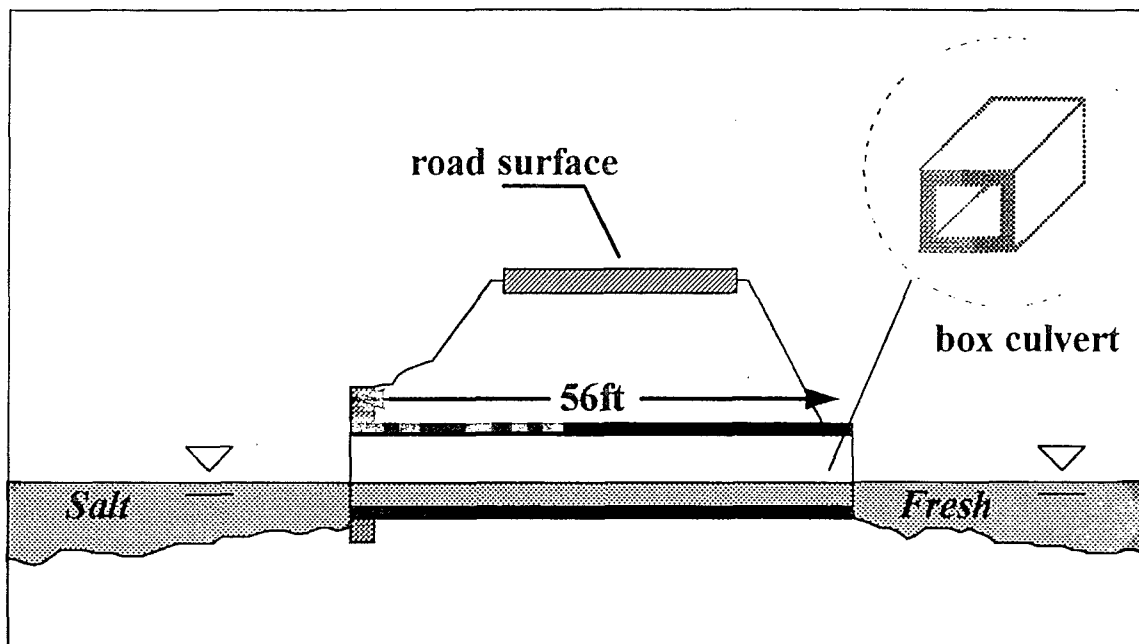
Cross sectional view of Wilders Dike with box culvert in place of existing culvert
